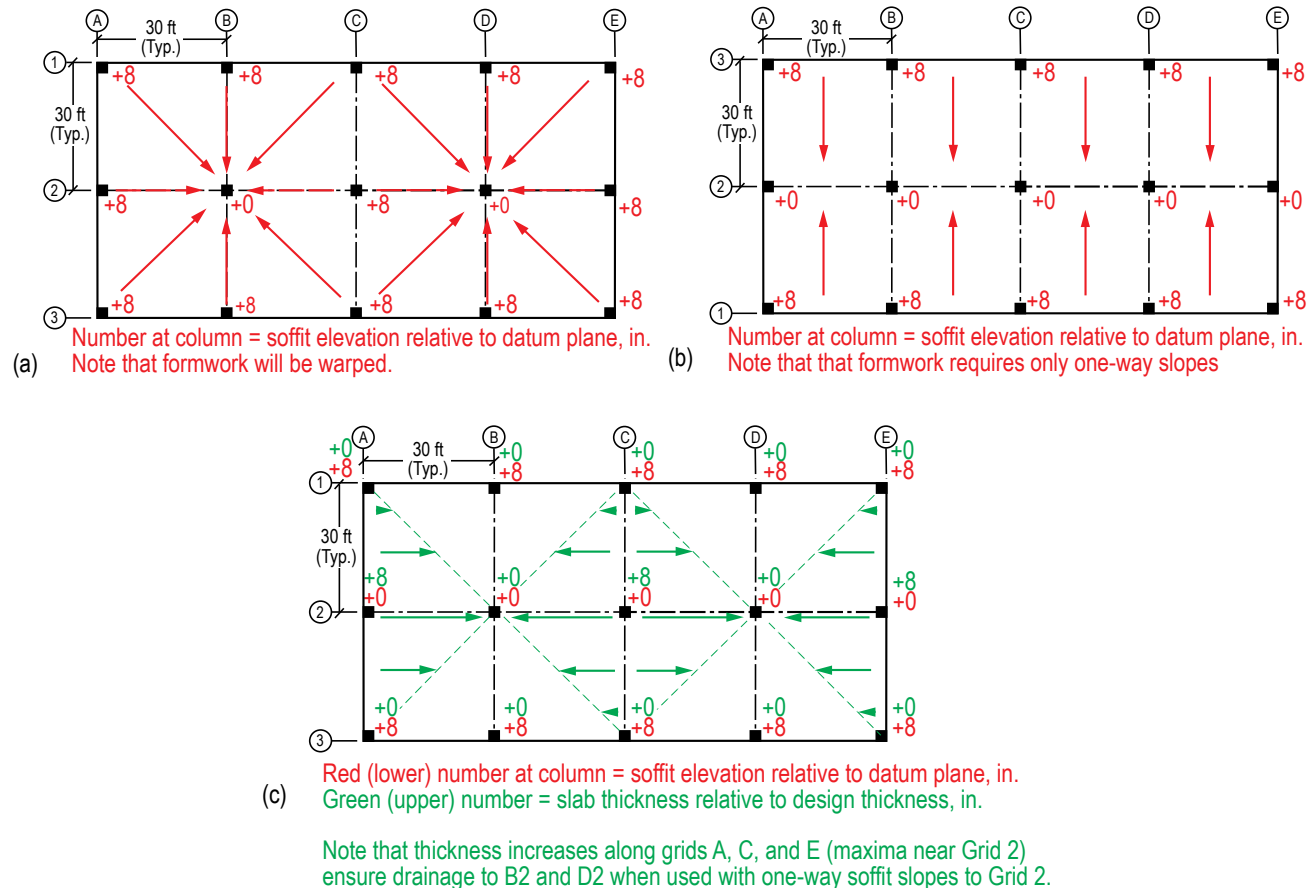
Schematic illustrations of an eight-bay roof plan with two interior drain points: (a) two-way sloping of the soffit creates constructability challenges because it requires warping of formwork; (b) one-way sloping of the soffit allows the formwork elements to remain straight; and (c) localized increases in slab thickness (or crickets formed using a topping course or added insulation) can be combined with one-way sloping of the soffit to enable two-way slopes.
